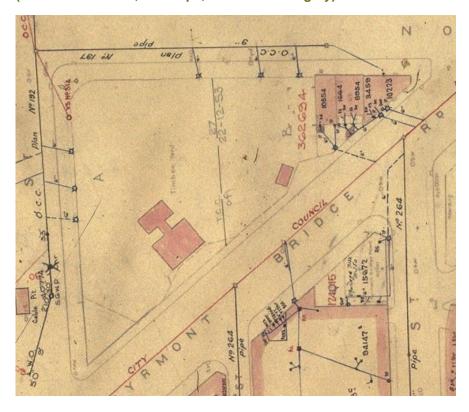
1940s – MWS & DB survey made in September 1940 and renewed in April 1949, showing the location of the extant buildings on the corner of Union Street and Pyrmont Bridge Road, and the hoarding around the timber yard, with a building noted on the Pyrmont Bridge Road frontage (Source: Sydney Water Archives, BLKWTL 3716-4)
